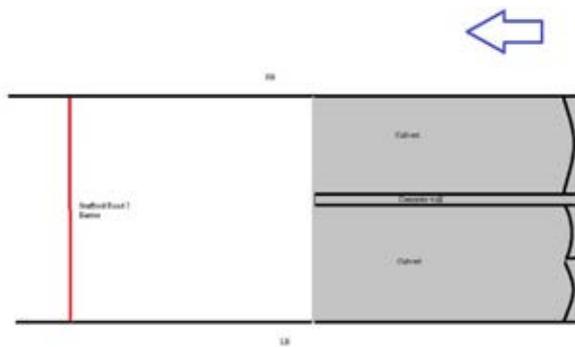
Field sketch of culvert. The two paths are shown with two further opening from the split at left bank.
